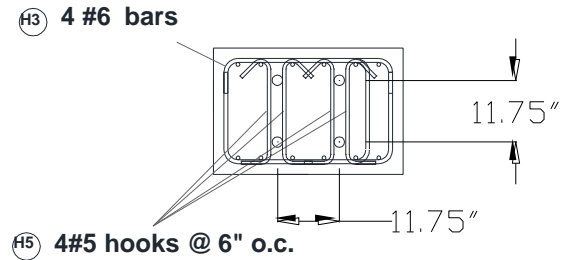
Plan view of head reinforcement for Specimen #1 (same for Specimens #2 and #3)
